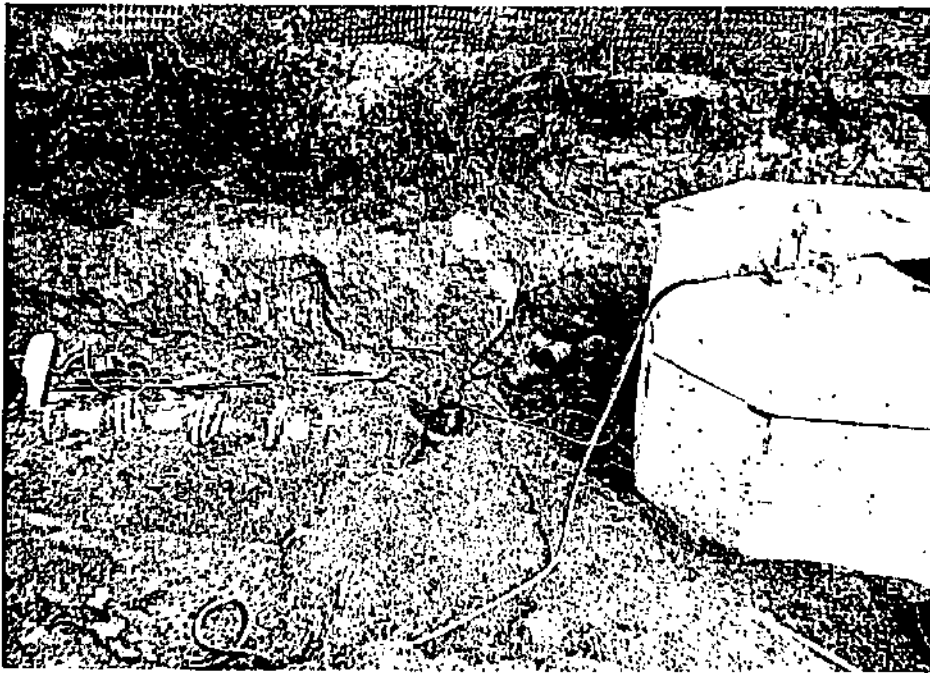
North Bloomfield, N.Y. 9/23/87. A pressure testing device and connections outside the meter vault.
